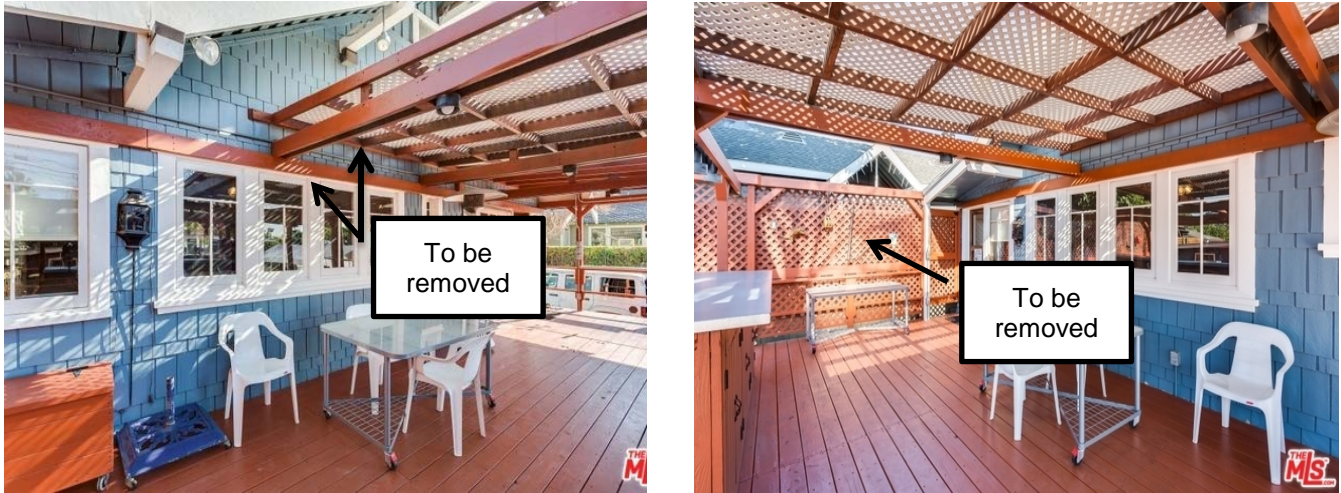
The deck's current roof is attached to the home's exterior wall. Those roof beams would be removed; the exterior wall will be repaired. The owner proposes to install a flat arbor-style roof, attached to the home's exposed beams. A trellis wall would also be removed from the deck (right photo).
